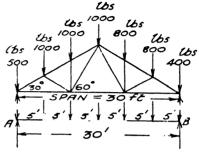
REACTIONS FOR A ROOF TRUSS.
